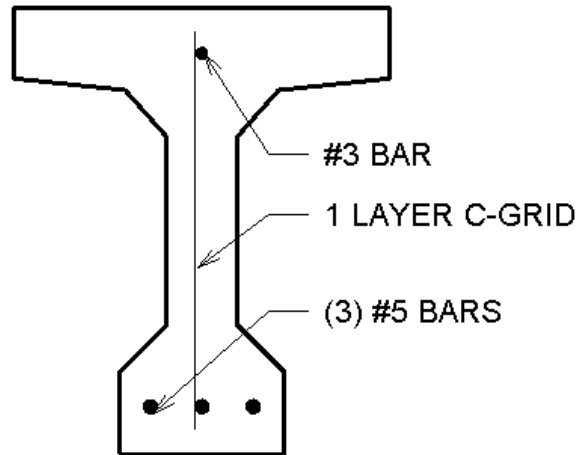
Cross-Section of Specimen 2 Minimum C-Grid Reinforcement
